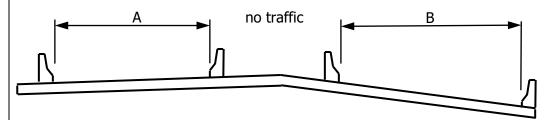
Cross-section view of a bridge deck with multiple median barriers.
